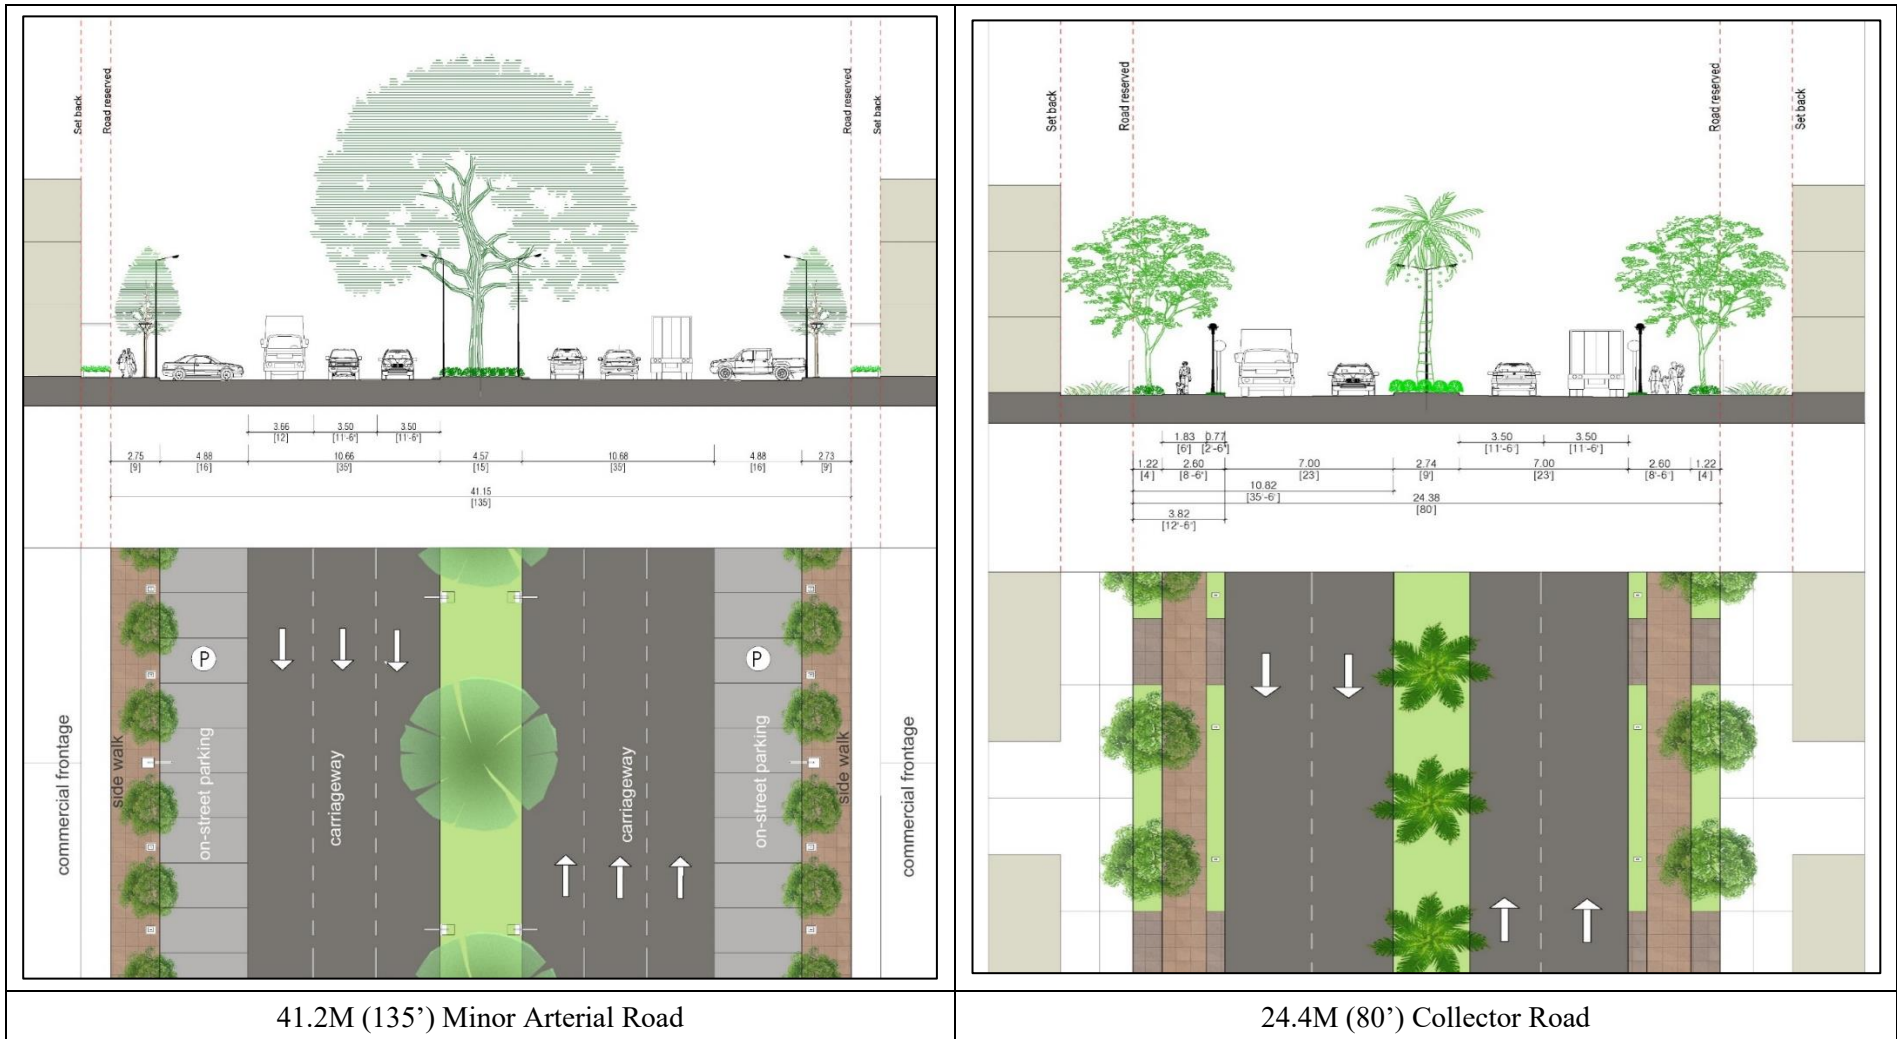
Typical Section of Minor Arterial Road or Collector Road
